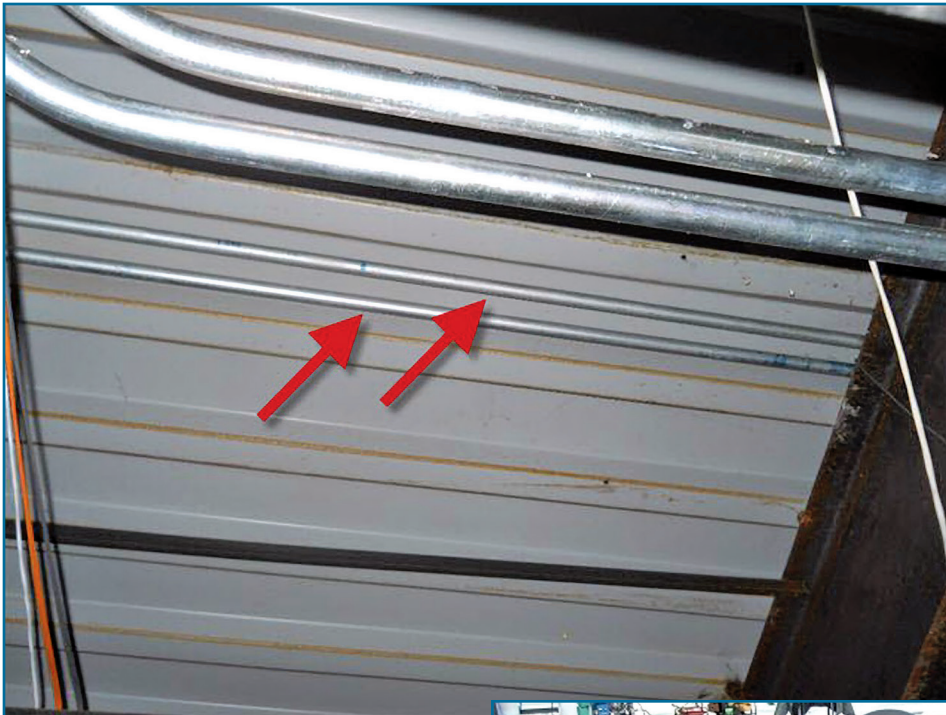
Arrows show fiber-optic cable and electrical conduit in flutes just below roof deck.
